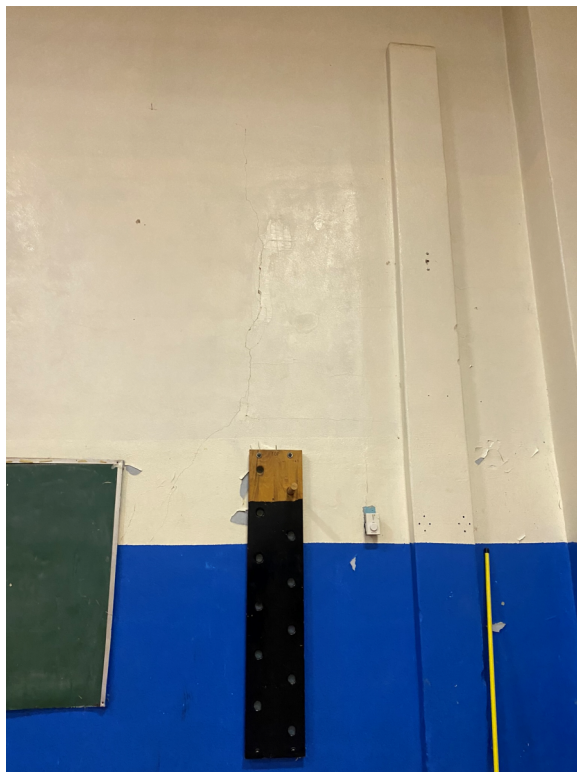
Gym interior, cracks on interior masonry wall
